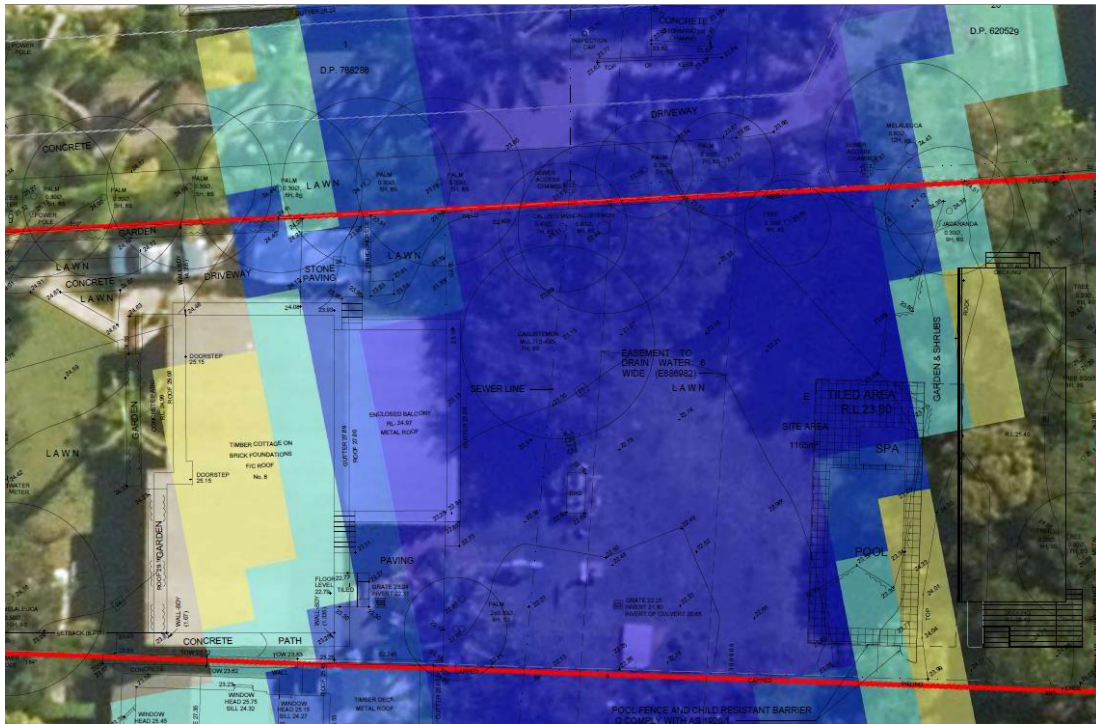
Ground floor plan overlay with PMF Flood Hazard map
